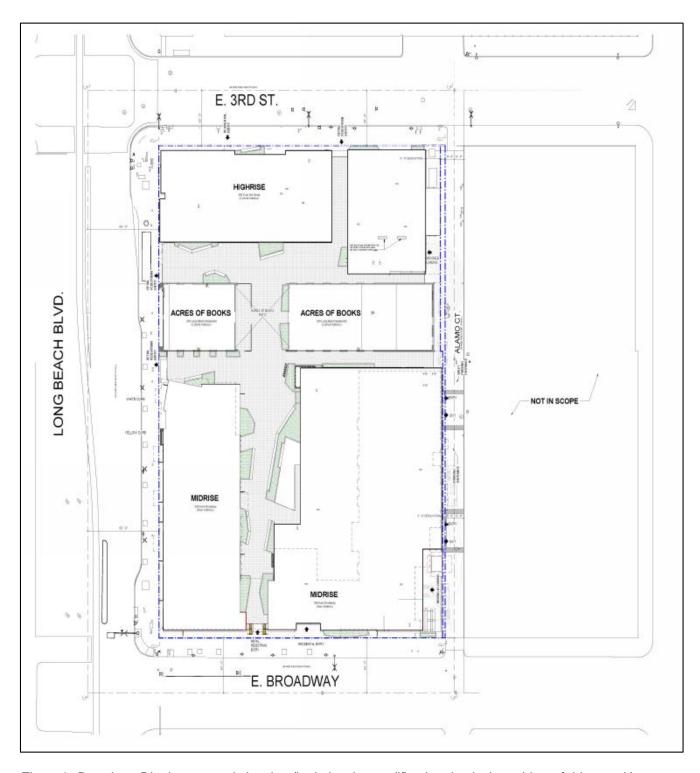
Broadway Block proposed site plan (includes the modification that is the subject of this permit).
